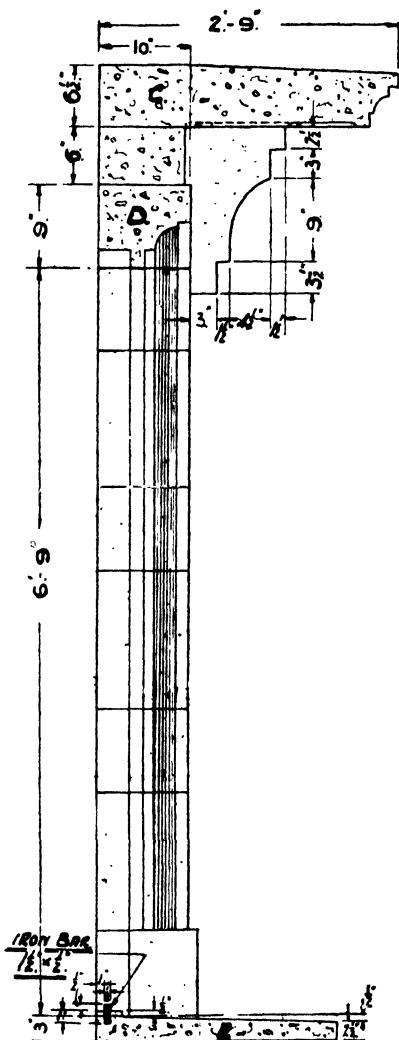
SECTION THROUGH CONCRETE DOORWAY
